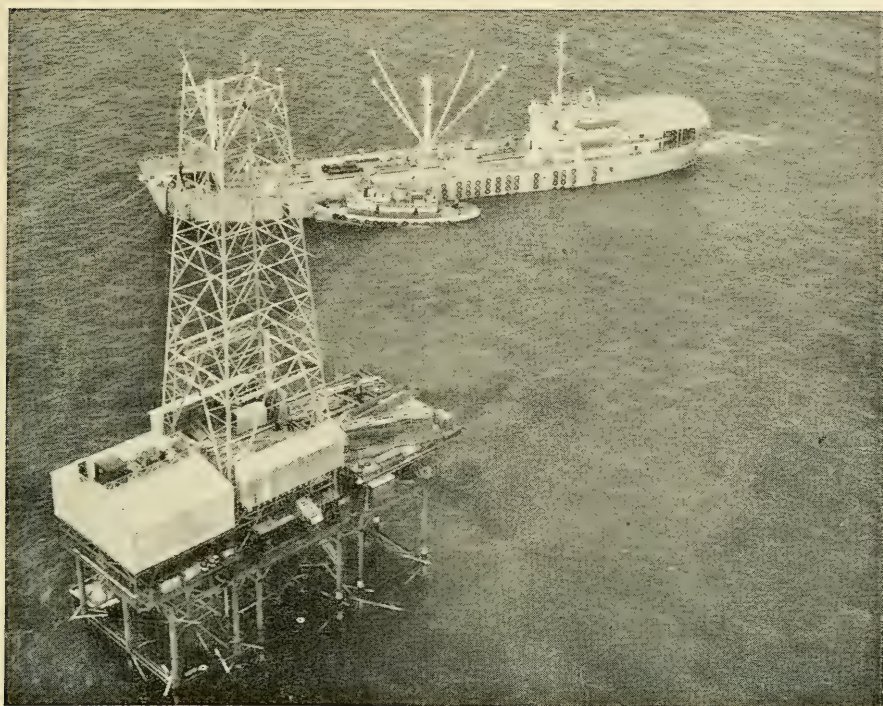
A six well derrick is shown being constructed atop a platform in the Gulf of Mexico. In the background, an LST is shown prior to hooking up to the structure to begin serving as a drilling tender.
